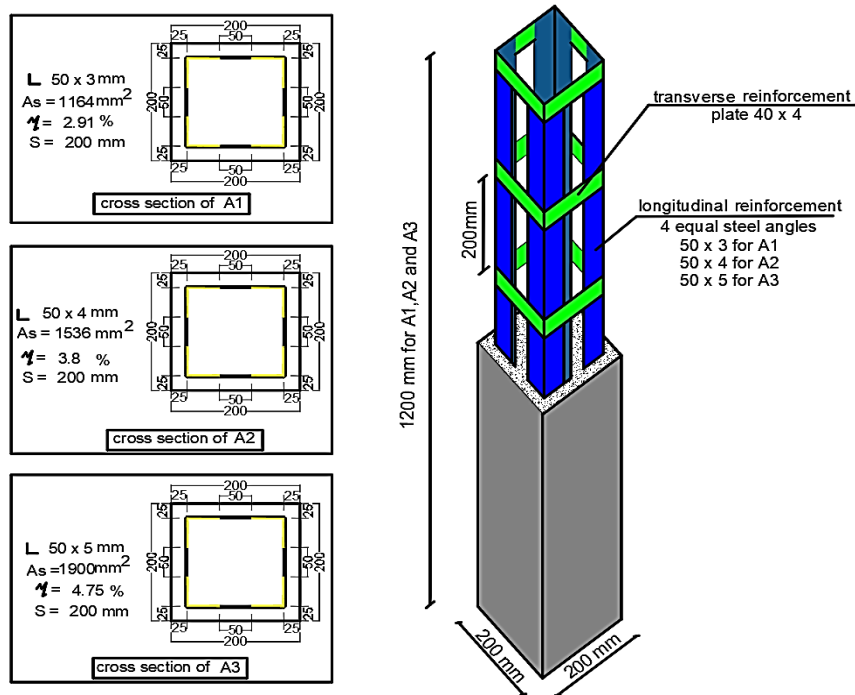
Cross section geometry and details for specimens A1, A2 and A3
